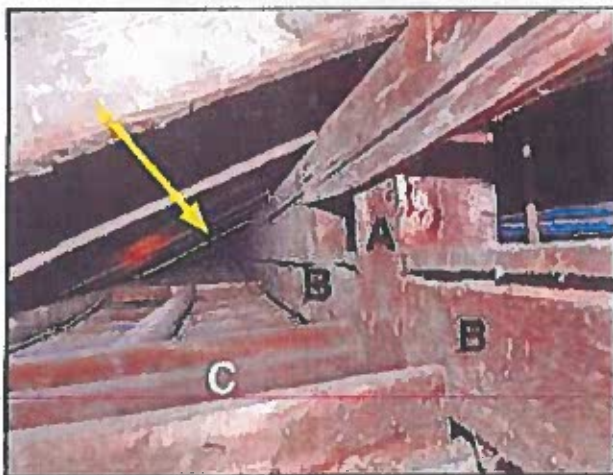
View of junction of ell loft wall framing with roof of first floor extension. Elements marked A, B, and C are the same elements marked in photo 72. The arrow indicates where the camera was positioned for photo 72.
